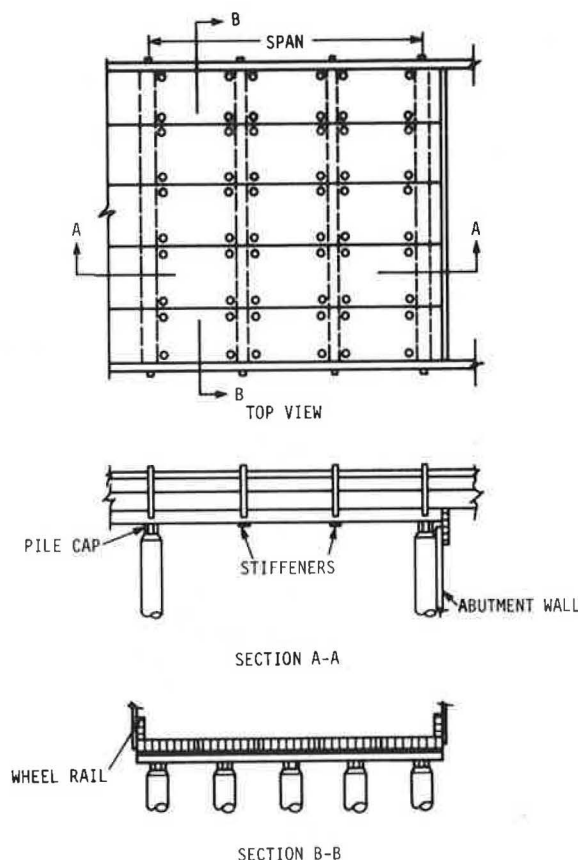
Glued laminated longitudinal timber deck highway bridge.
